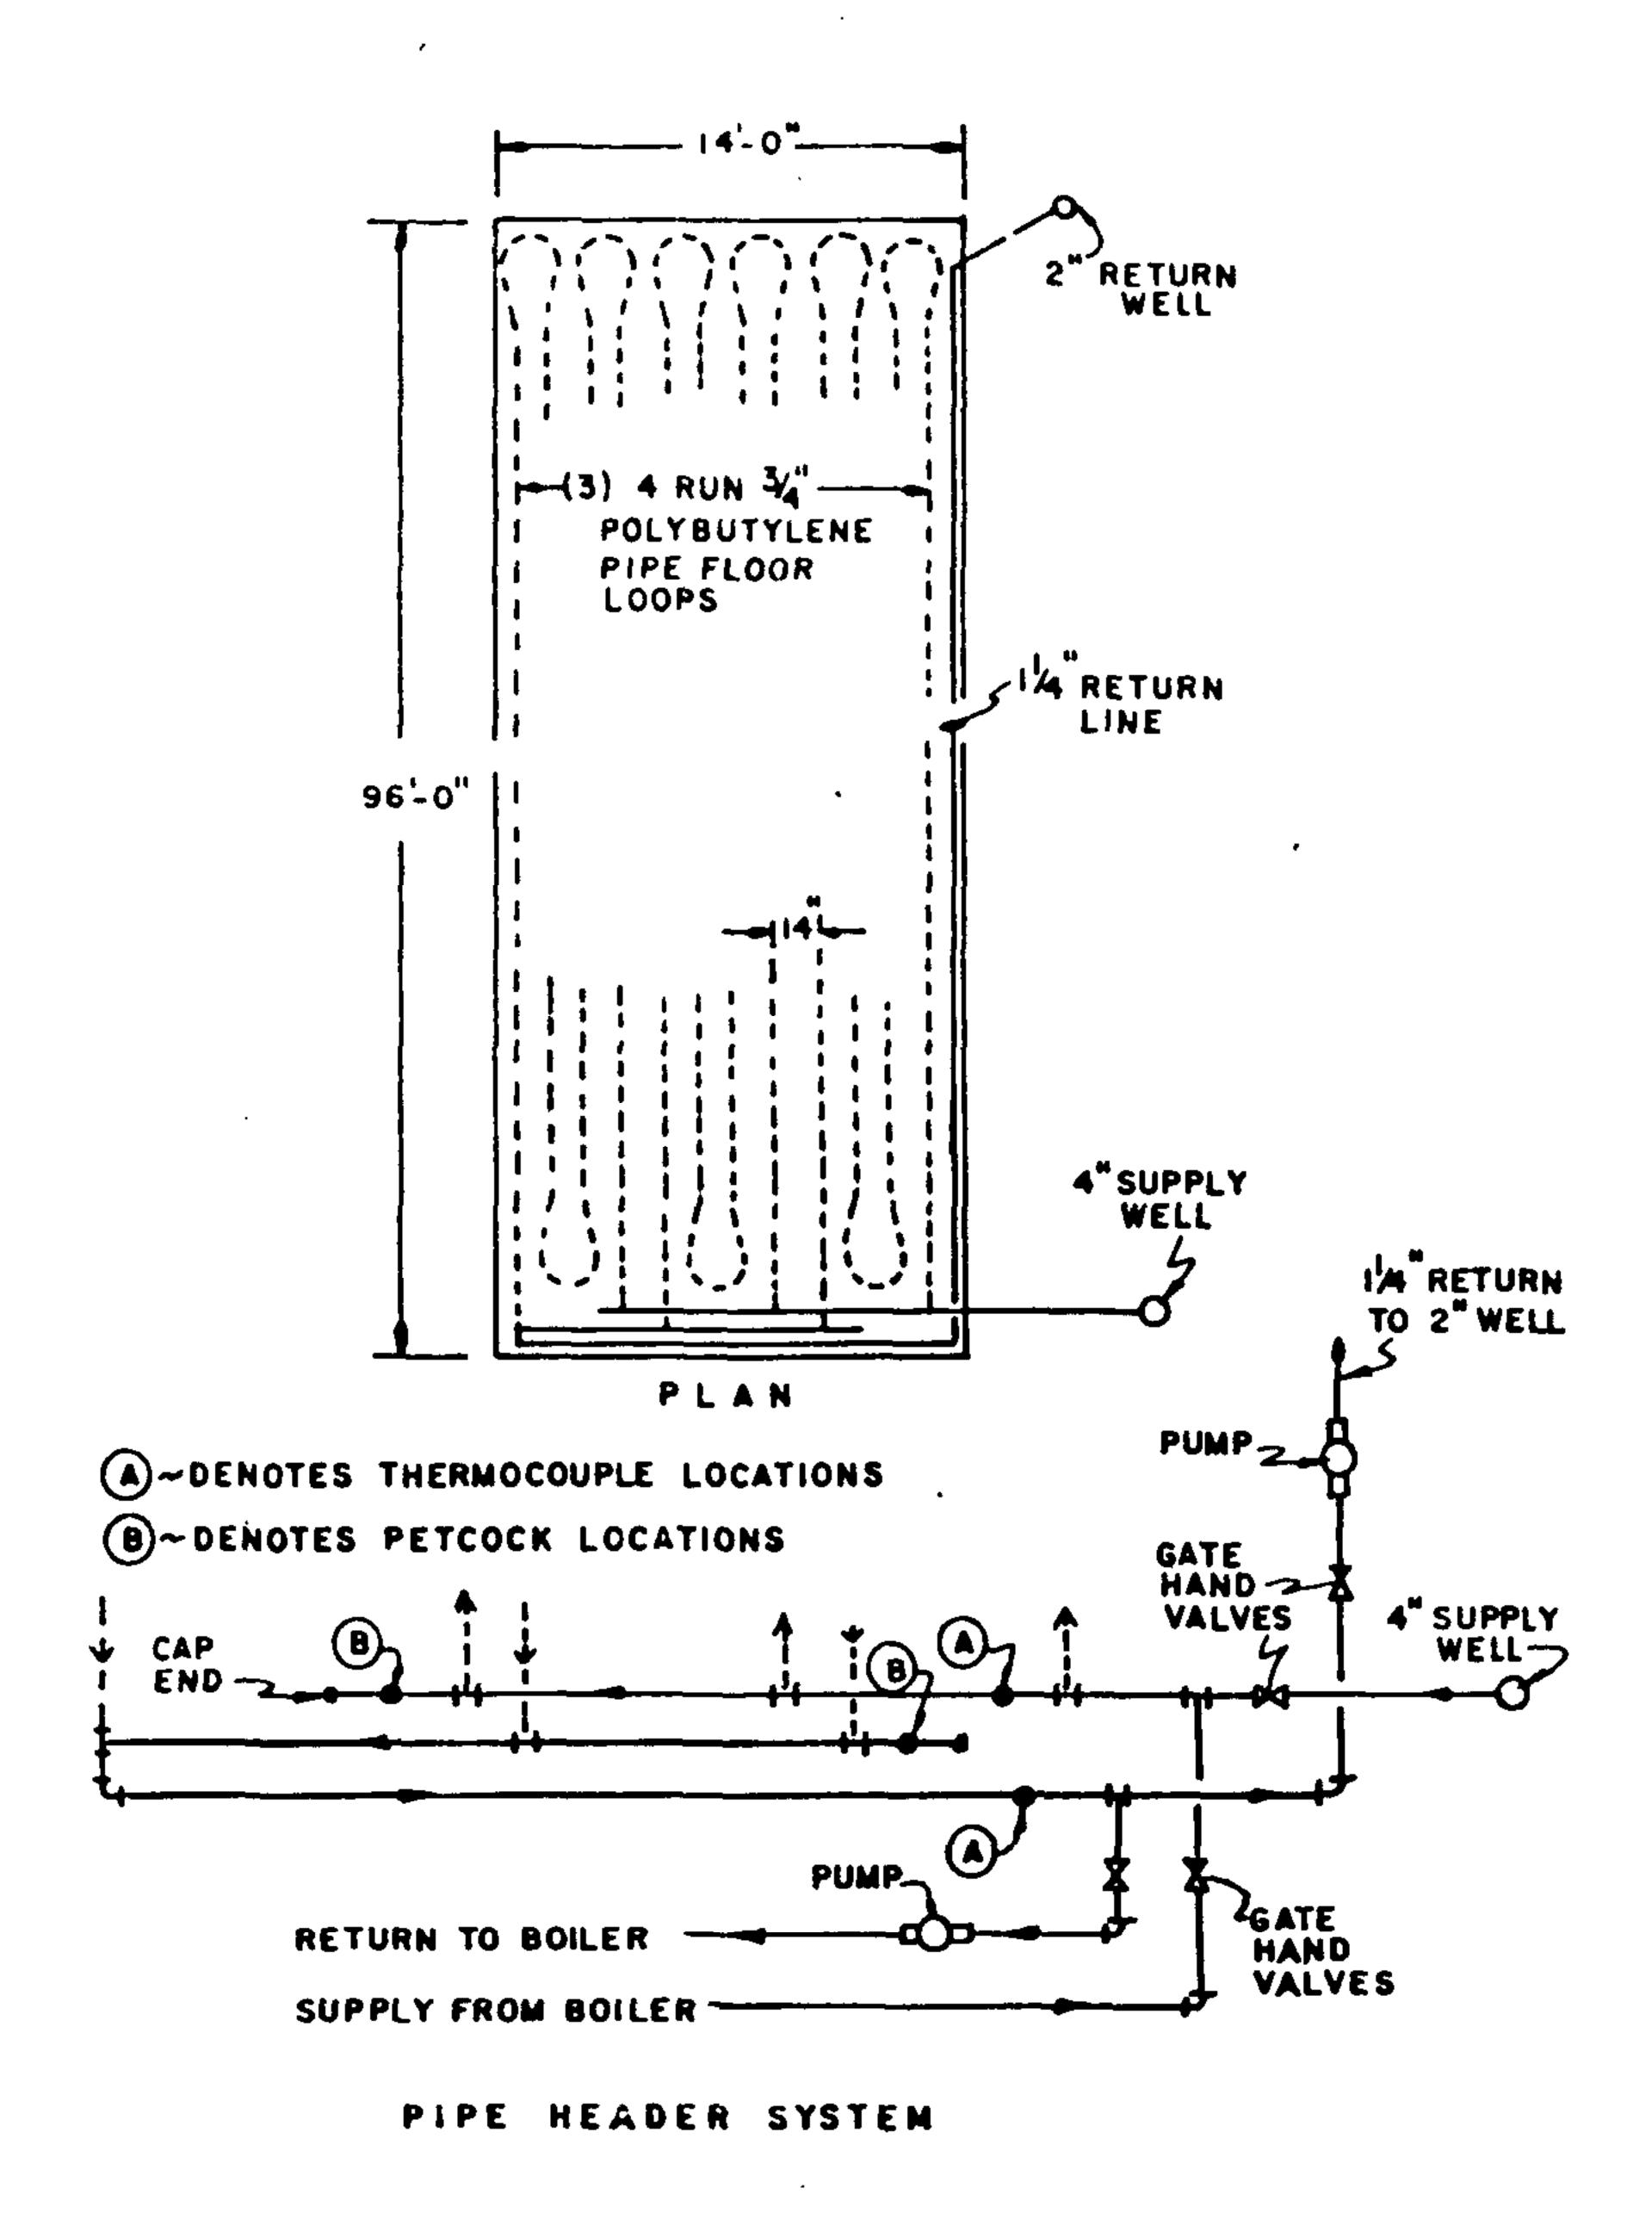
Engineering details for a heated floor incorporating a double-header return system.
